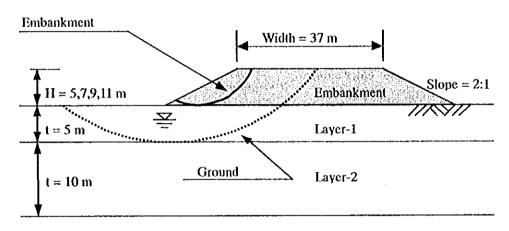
A Typical Slope Failure and Ground Failure
